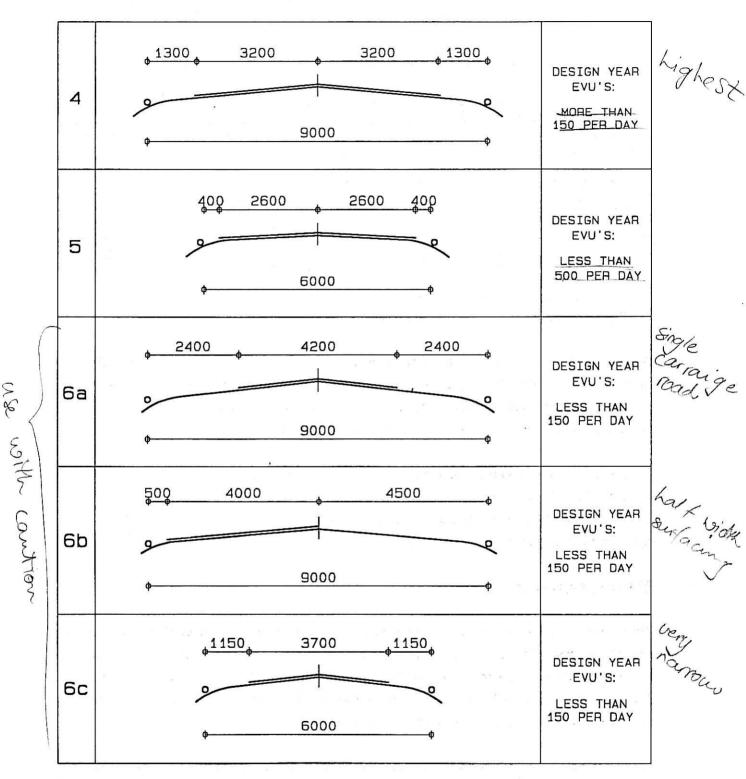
RECOMMENDED PAVEMENT CROSS-SECTIONS more in thick document
